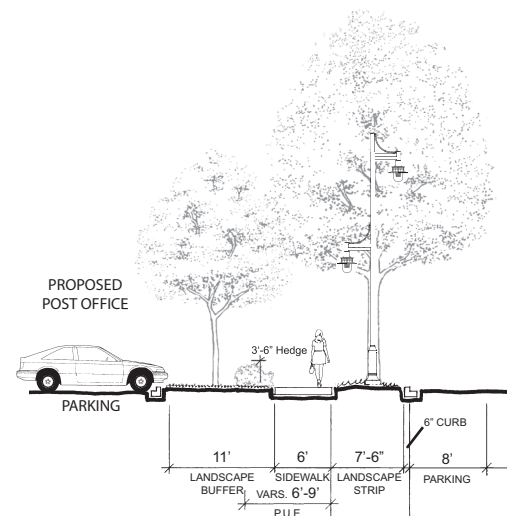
B.37: Buffer sidewalk from surface parking along Solano Avenue
